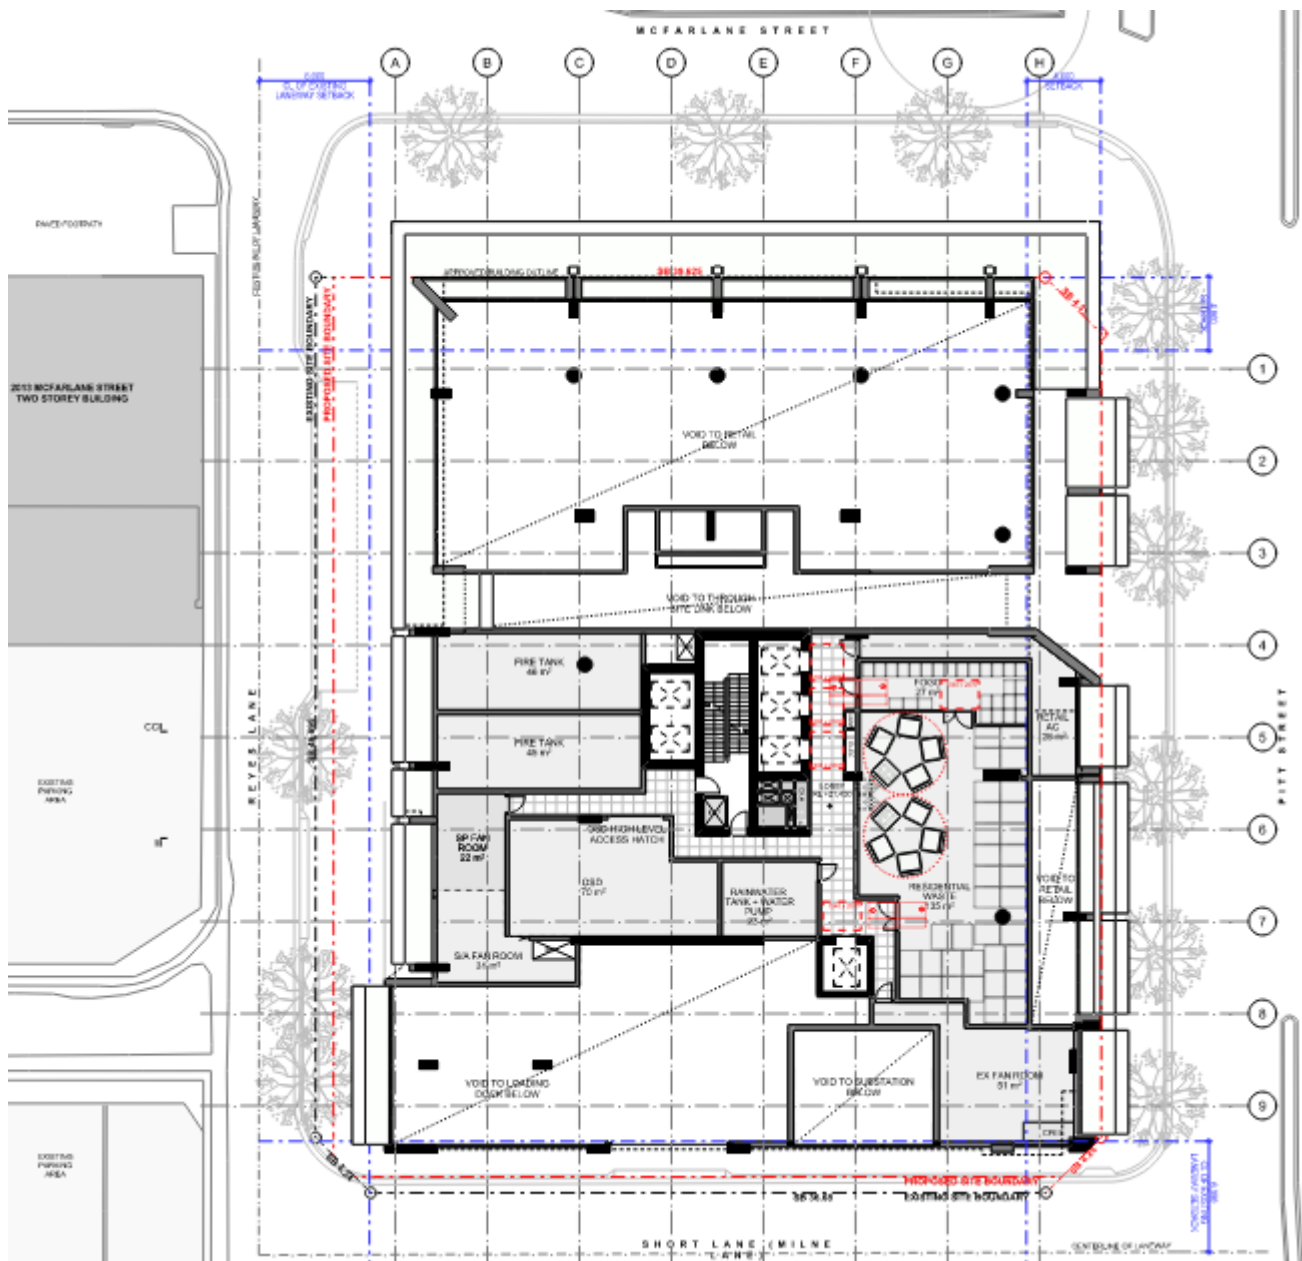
An extract of the proposed mezzanine level, detailing the proposed waste room and associated services
